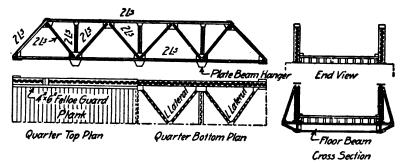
PLAN OF A LOW OR "PONY" TRUSS HIGHWAY BRIDGE.
